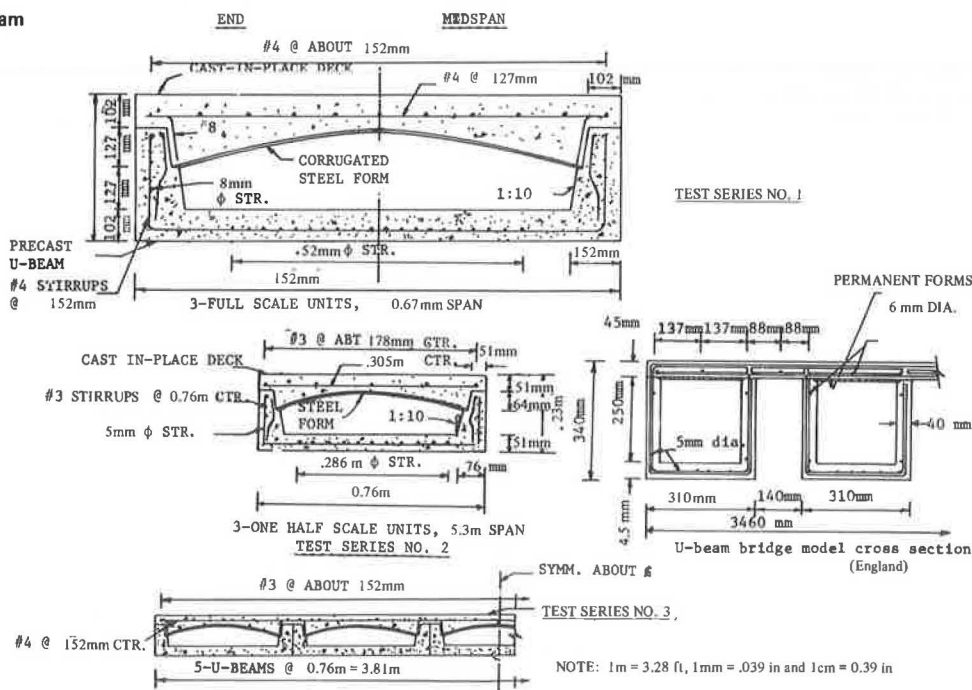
Typical elevation and cross section of concrete bridge slabs.
